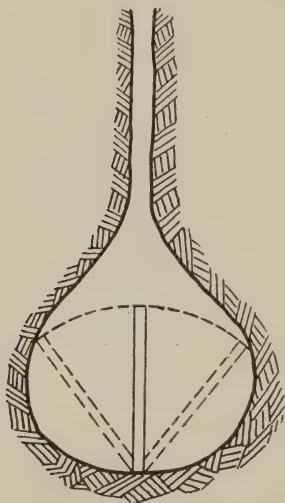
View of chambered drill hole showing how "springing gage" is used.
